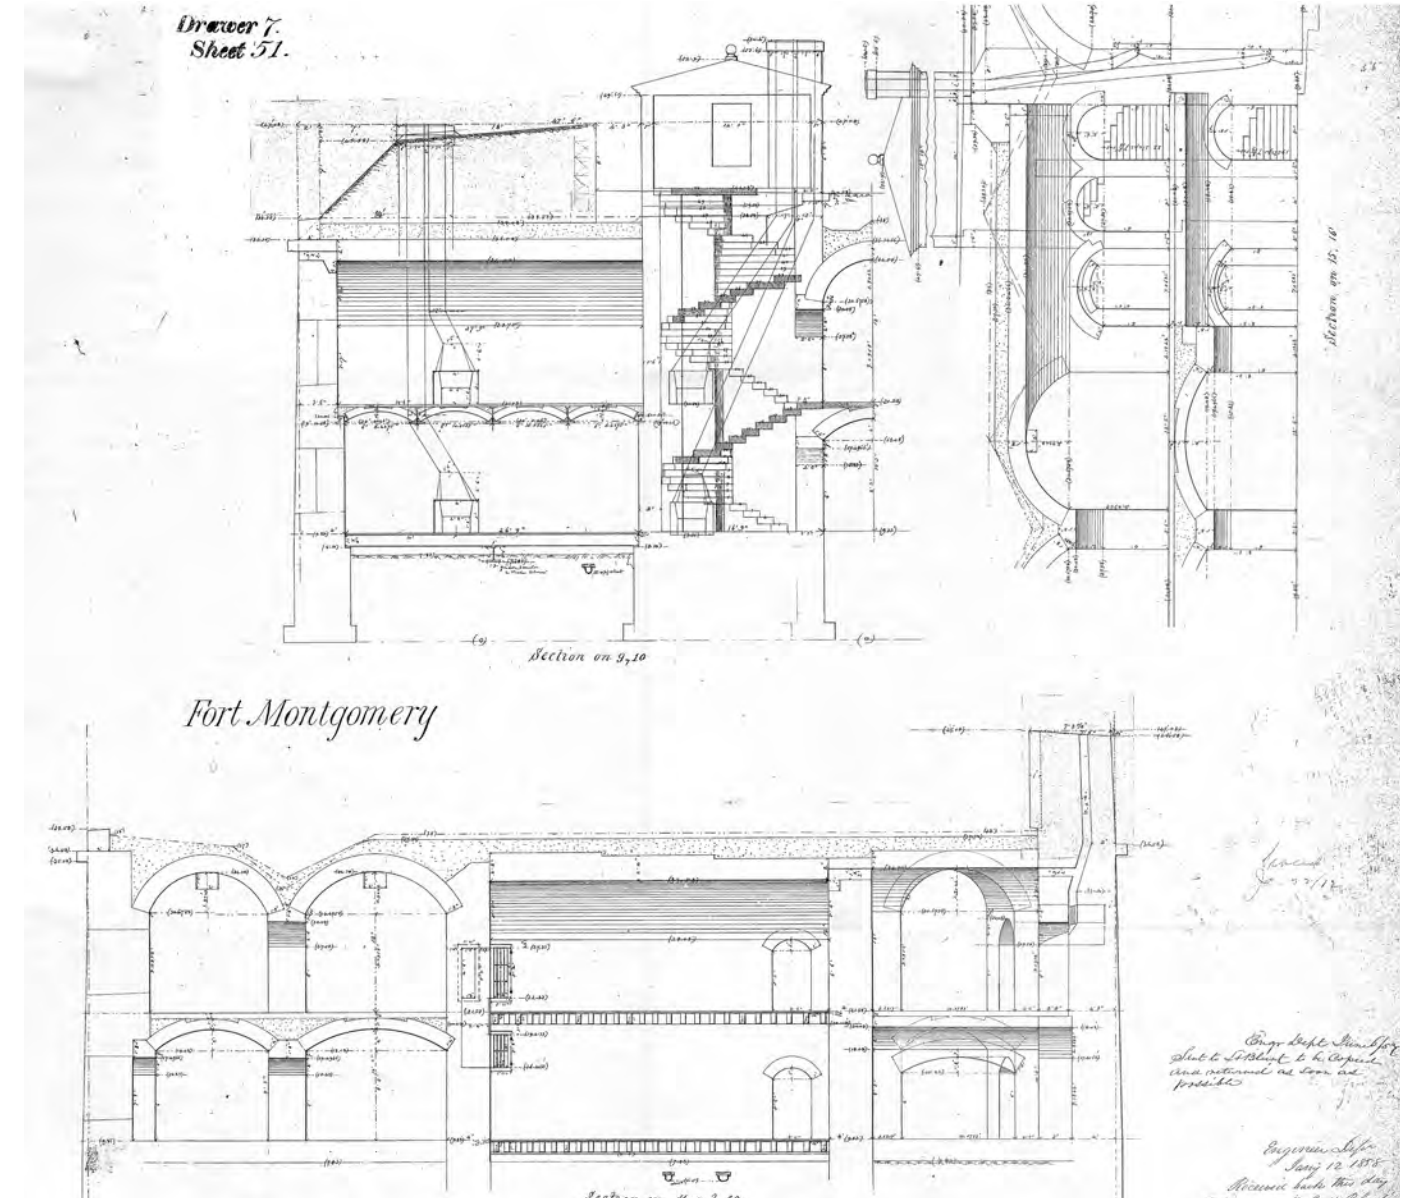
| Drawer 7 Sheet 51 | Jim Millard
